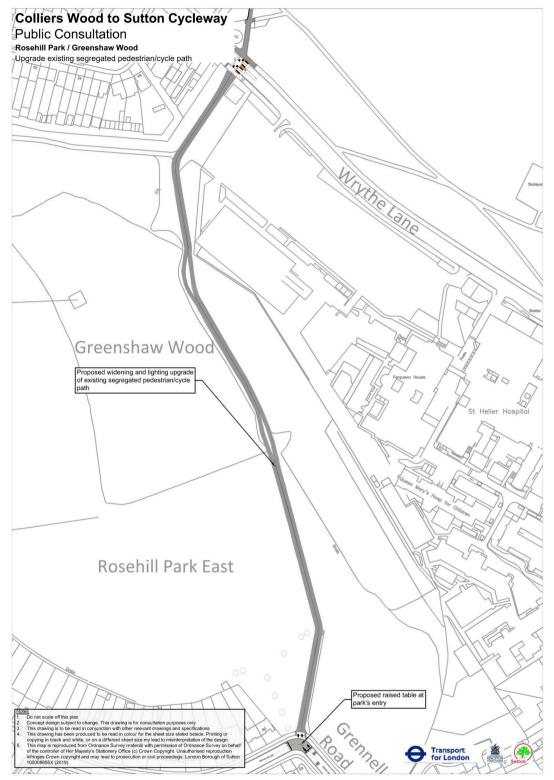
Plan of proposed upgrade to the existing segregated pedestrian/cycle path linking Wrythe Lane with Rosehill Park West and Grennell Road (LB of Sutton)
